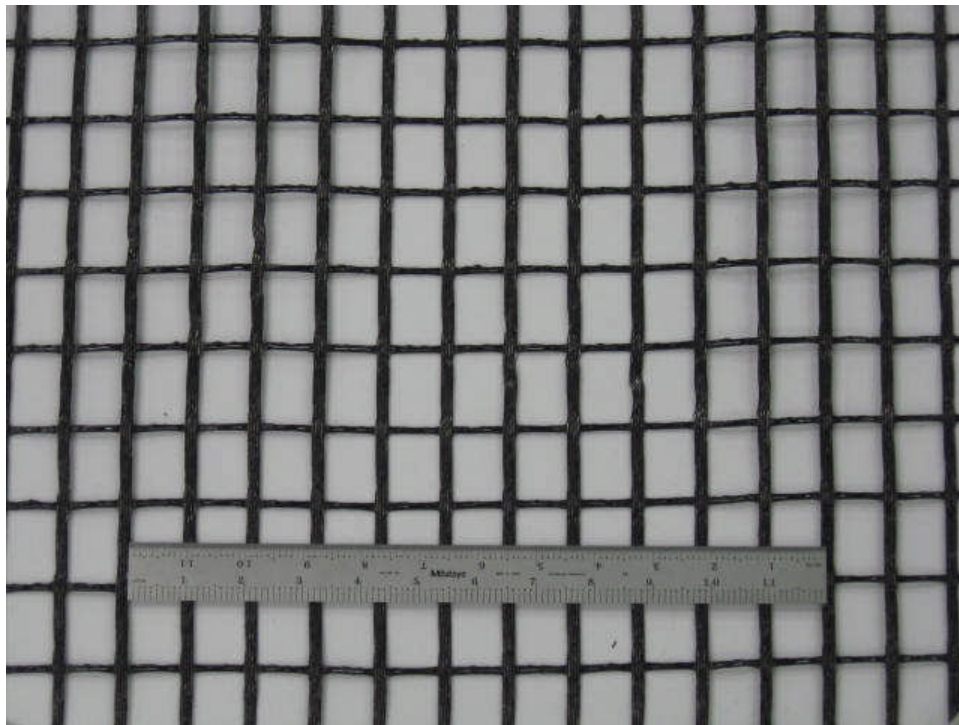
Photo of Miragrid 7XT (machine direction is perpendicular to ruler shown).
